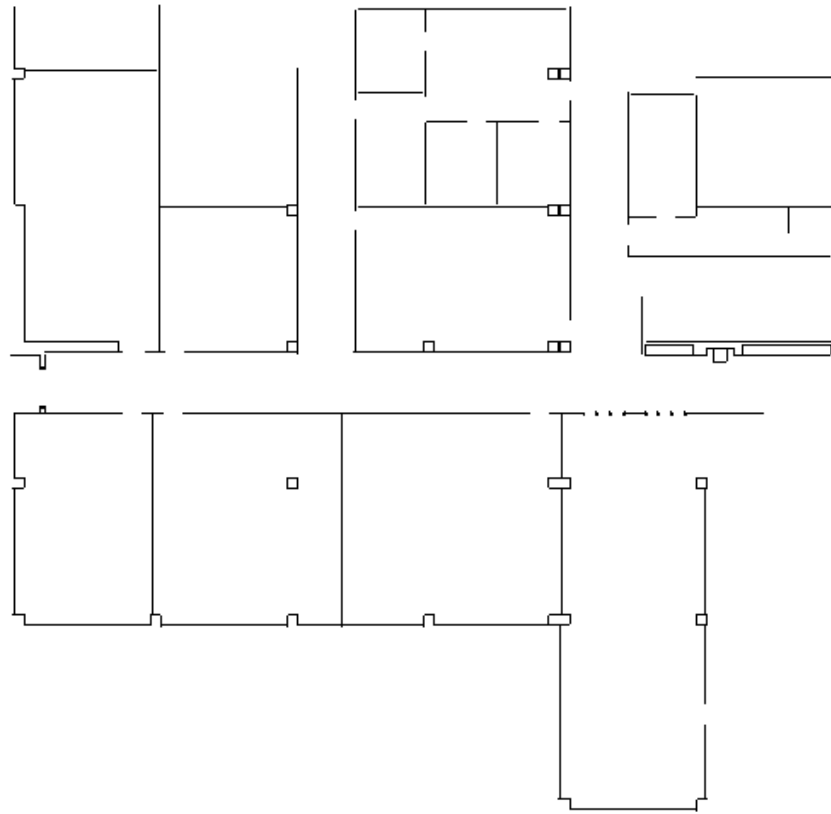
Revised model of Clyde Building 4th floor (northwest corner).
